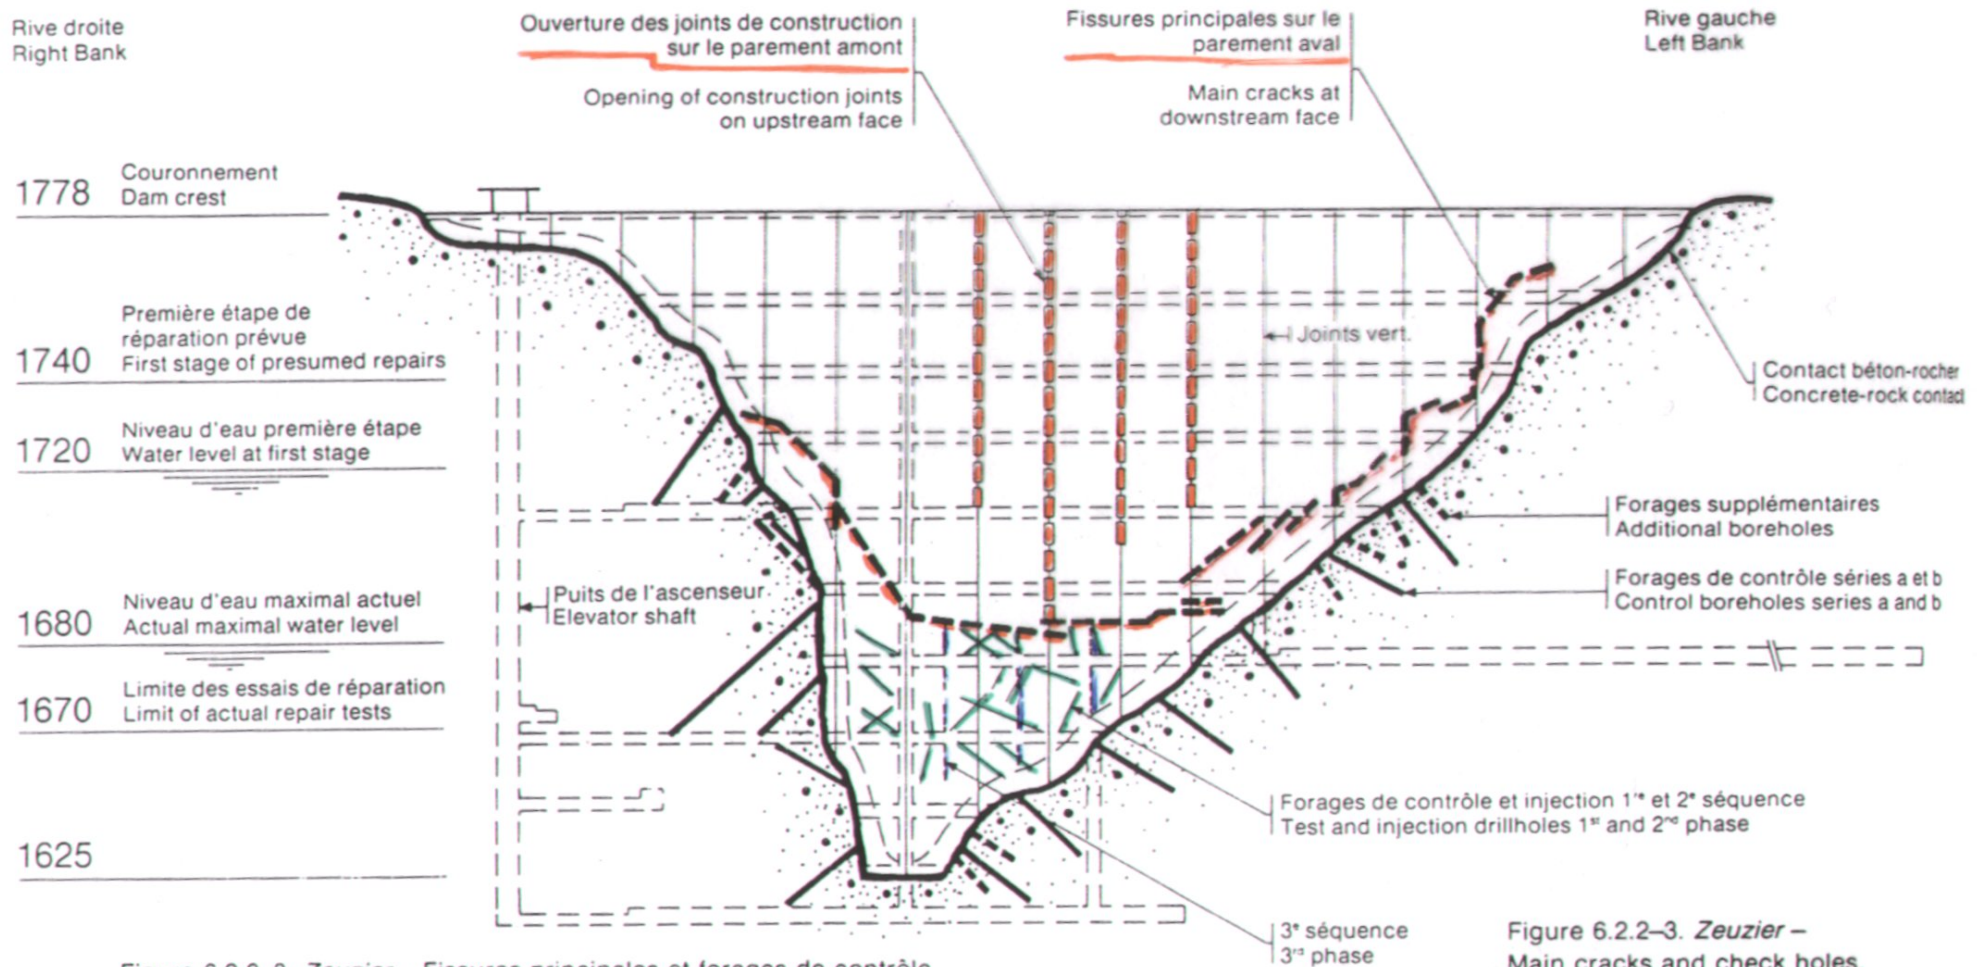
Zeuzier – Main cracks and check holes.
